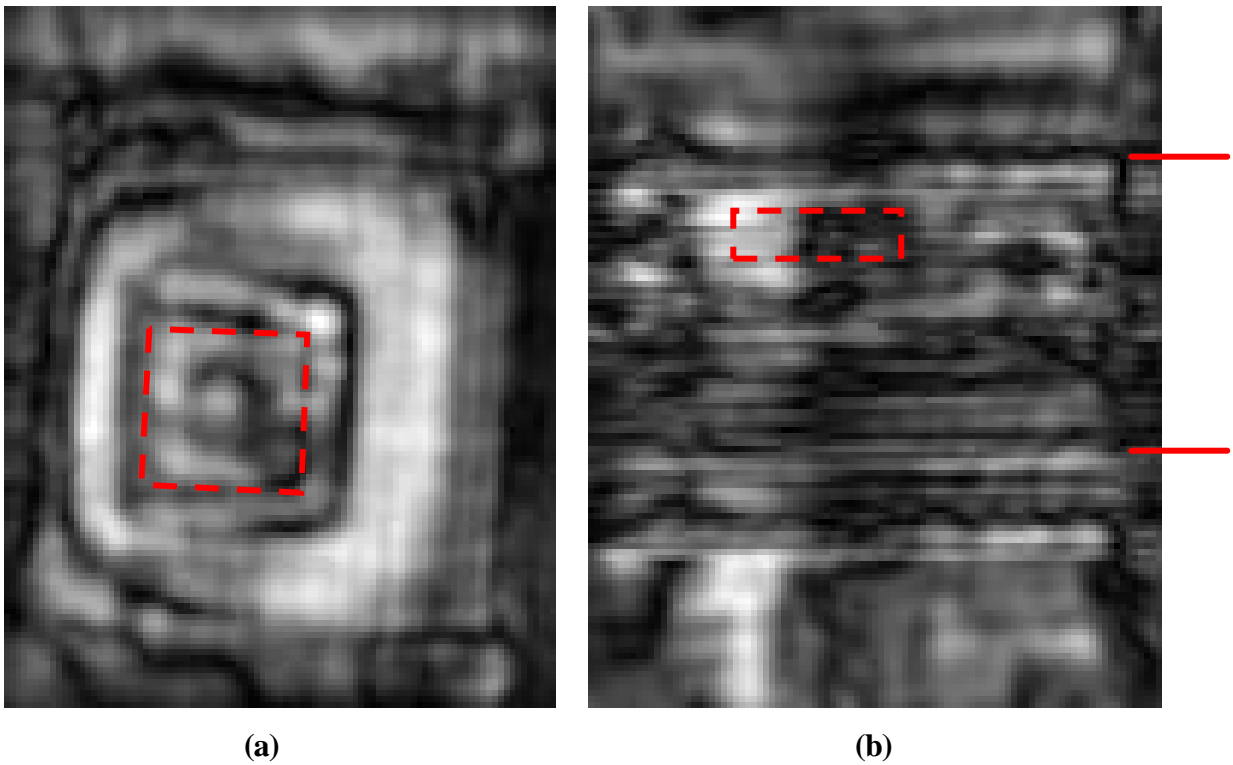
PERES II results from a simulated concrete crack specimen with an approximate 0.25 cm air gap. (a) Plan view image of reconstructed data (b) elevation view of reconstructed data.
